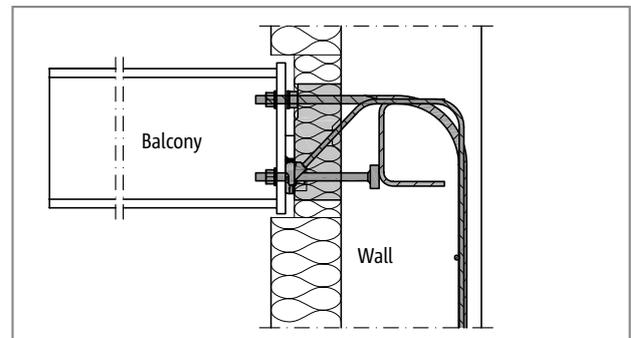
Schöck Isokorb® T type SK-WU-M1: Special construction for wall connection on the basis of the shear force bearing levels M1 for wall thicknesses from 200 mm
